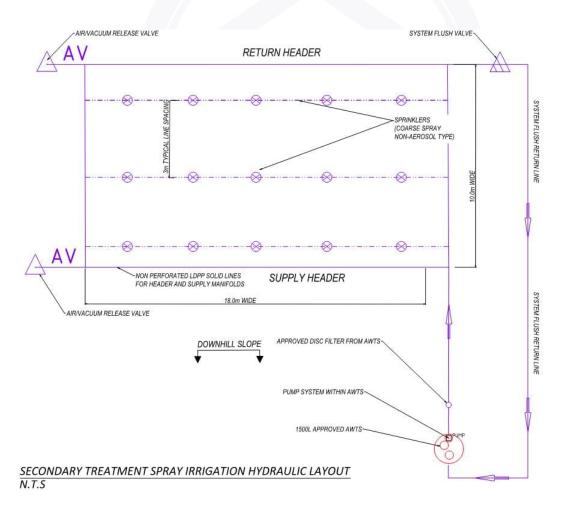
PROPOSED WASTEWATER IRRIGATION LAYOUT
